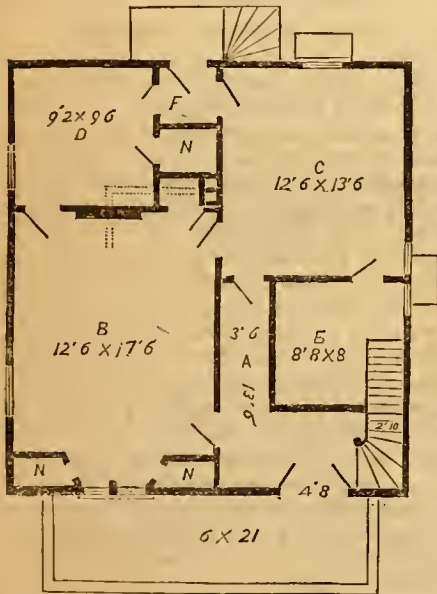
FIRST FLOOR, OR GROUND PLAN. A., Hall; B., Sitting Room or Parlor; C., Kitchen; D., Bedroom; E., Bedroom or Store Room; N., N., Closets, sizes indicated.
